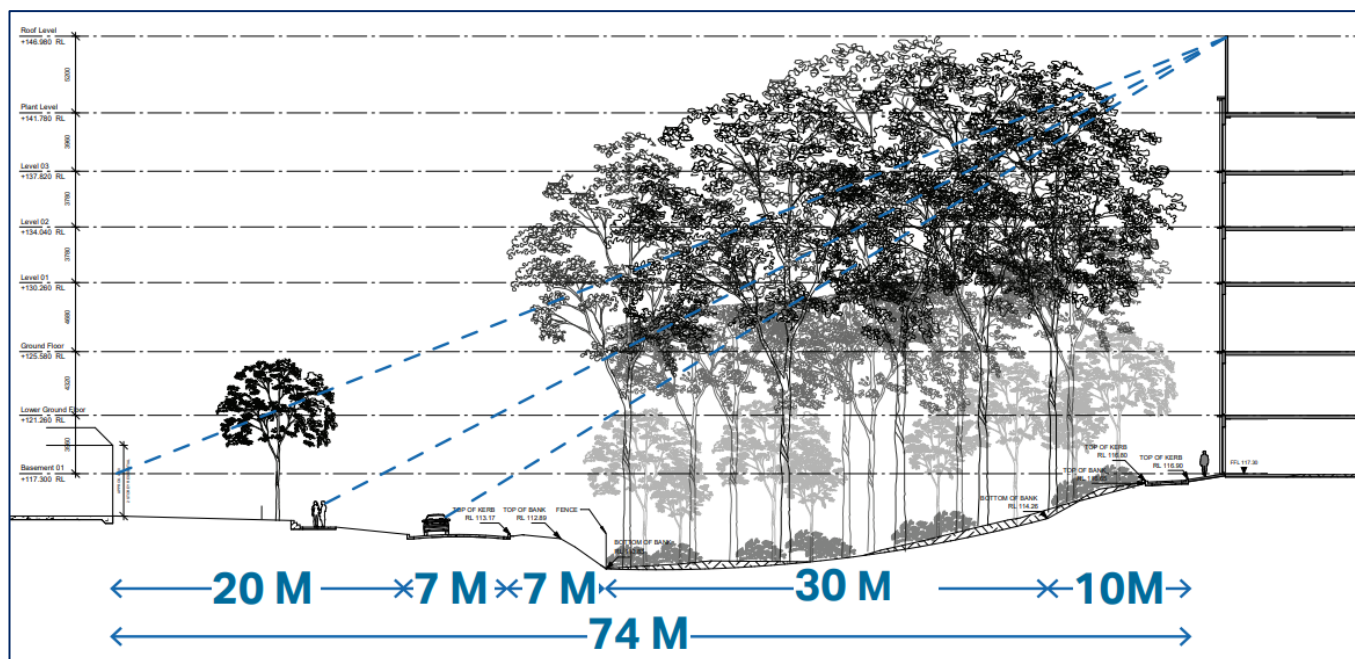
| North-south section showing the height of the tree canopy and the SIP building, and viewpoints towards the SIP building (Source: Applicant's RtS 2026)
